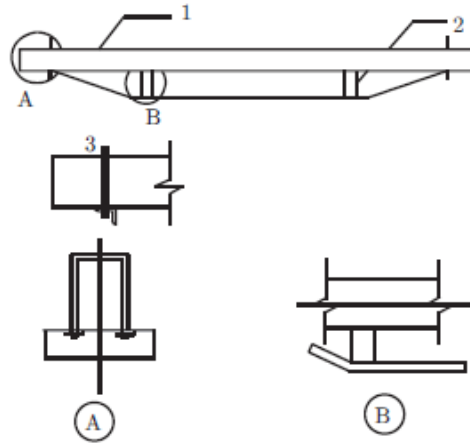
Strengthening with bottom-bracing steel tension rods: 1 – wood beam; 2 – brace rod; 3 – steel tension rod (Lu, 2010)
